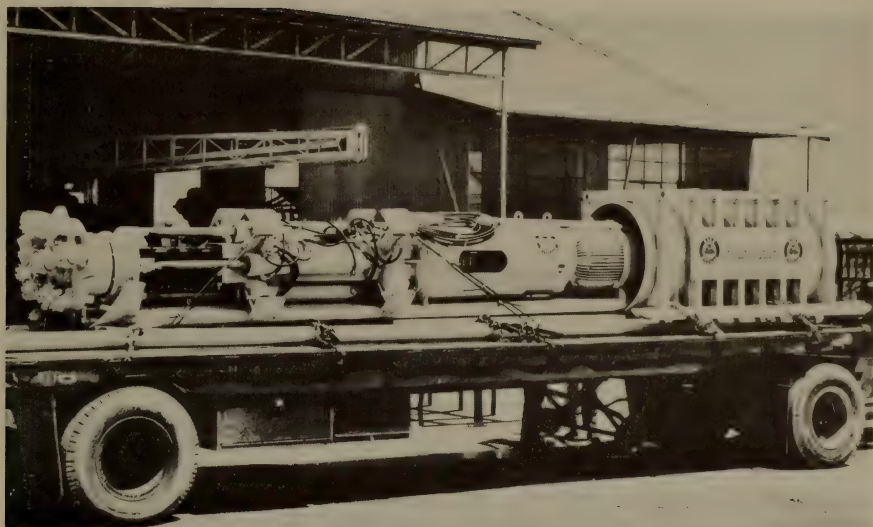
Forty-Inch-Diameter Boring Machine. (Courtesy, Hughes Tool Co.)
